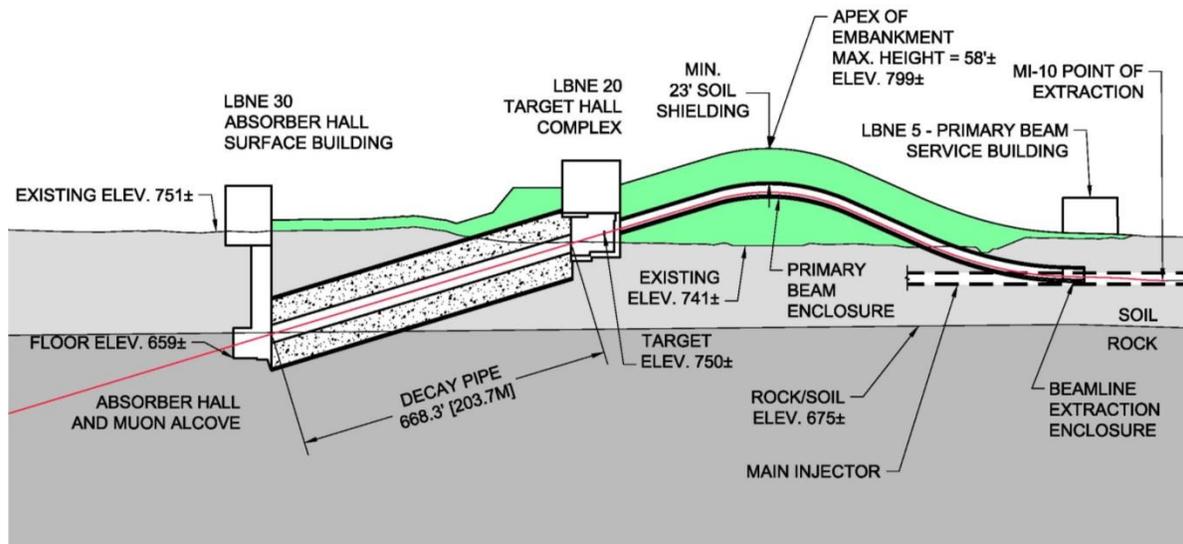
LBNE MI-10 Shallow Near Site schematic longitudinal section view.
